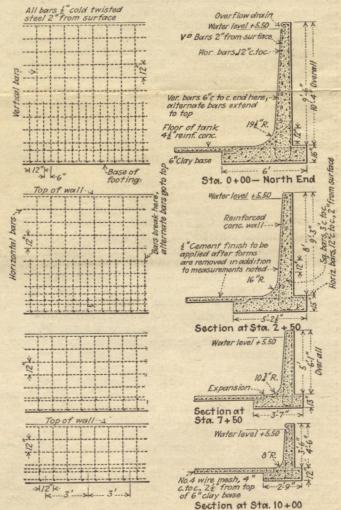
CROSS-SECTIONS OF TANK WALL Longitudinal and transverse views at both ends and at two intermediate points.
